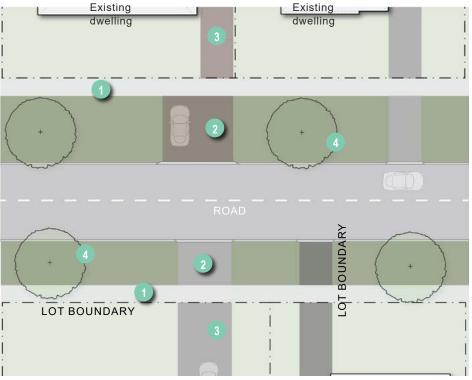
Typical Richmond Hill Precinct streetscape illustrating proposed footpath and crossover materials.
